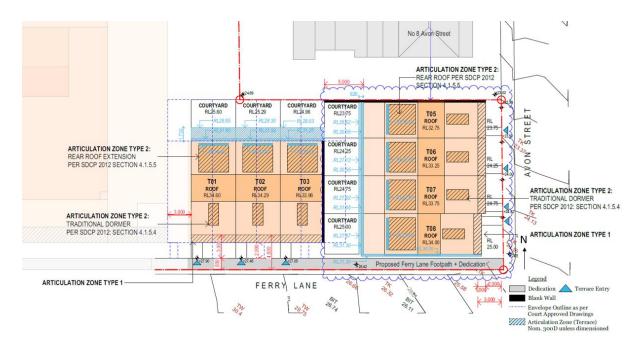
Proposed terrace building envelope plan with articulation zones depicted in blue
